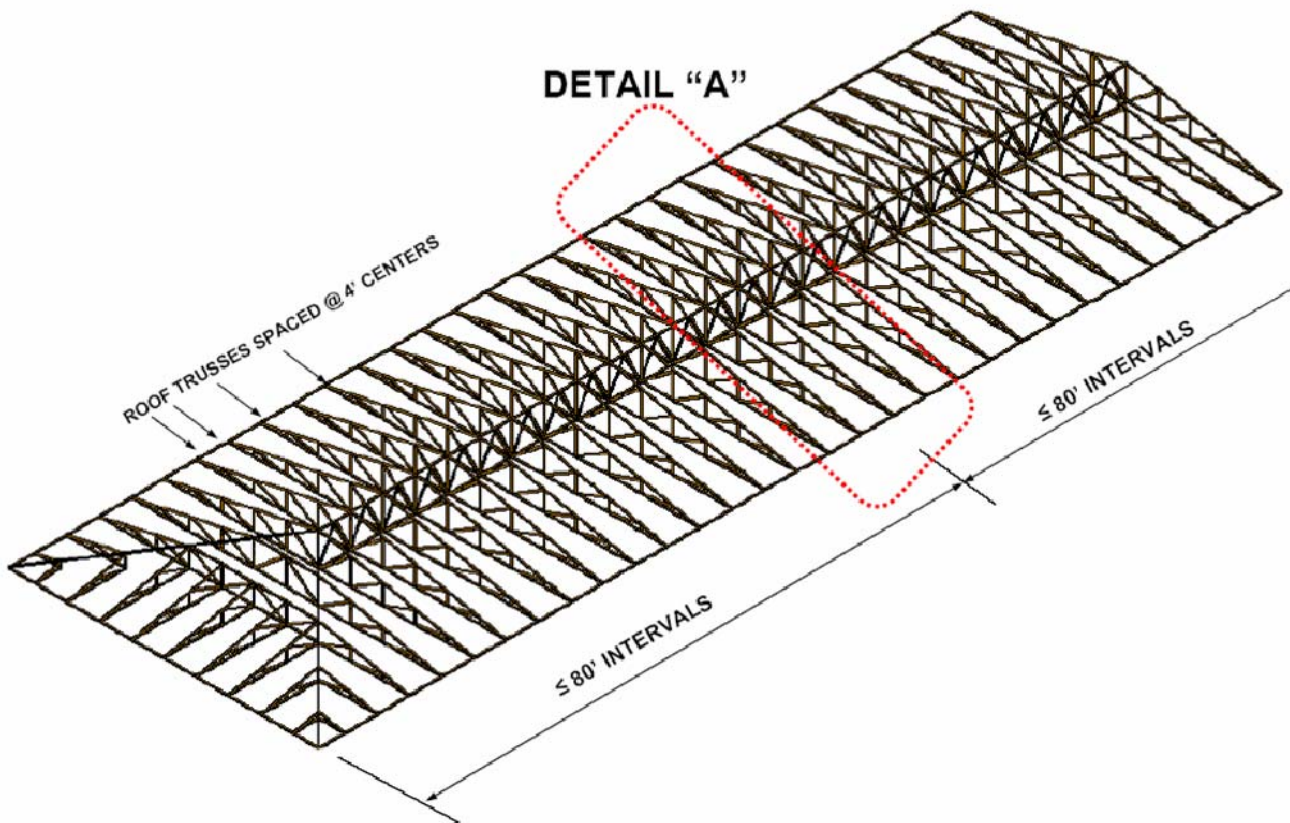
Location of temporary roof expansion joints for light-framed wood and steel structures, when the roof plan dimension (length or width) exceeds 80 feet in one direction.
